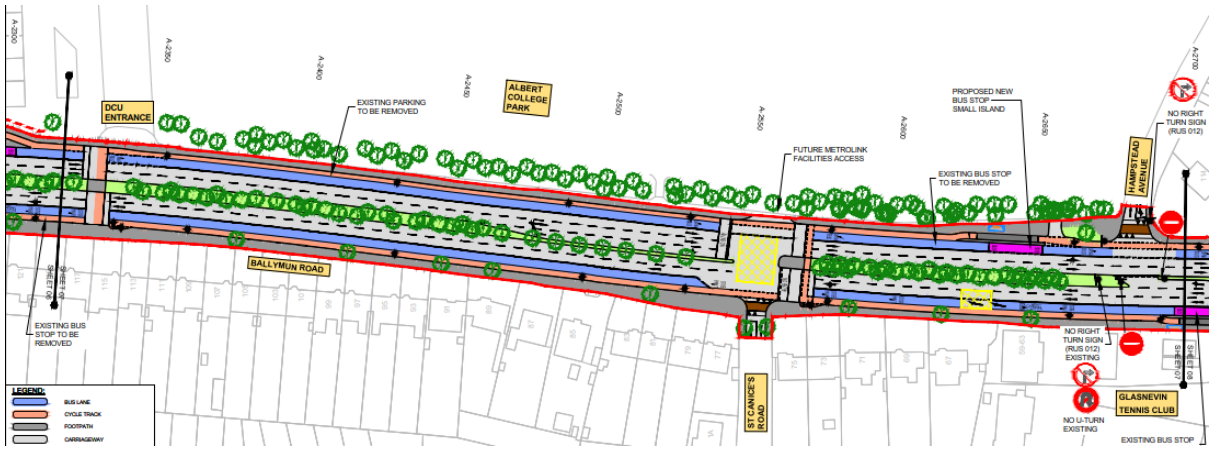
Extract 2 from General Arrangement Drawing
